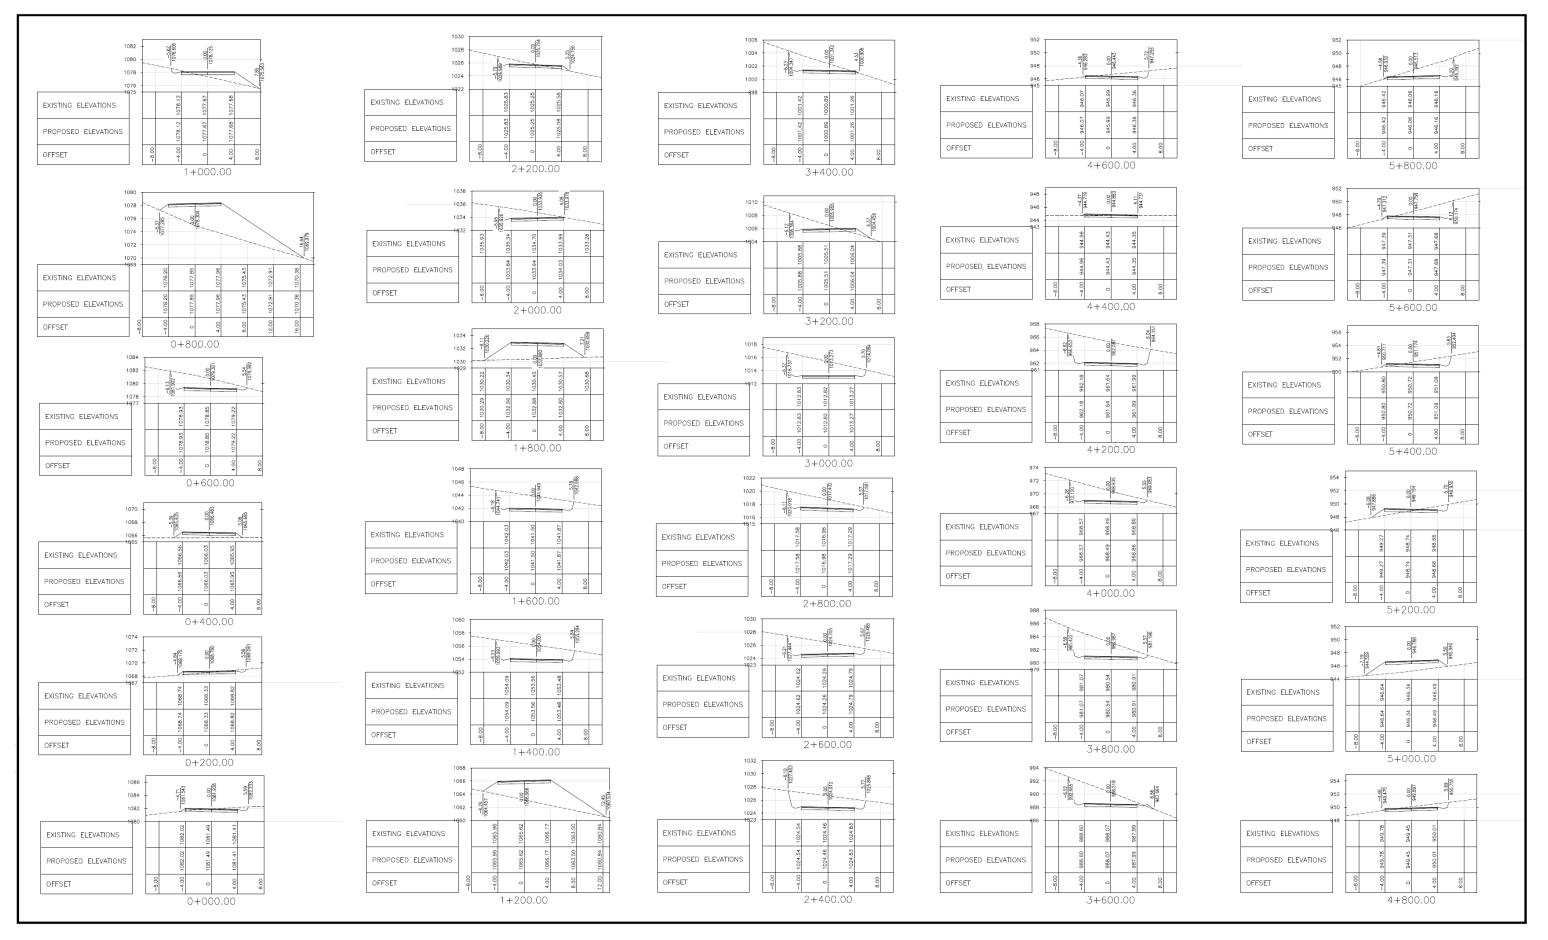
Smithfield Dam – Cross sections of access road to Nonguqa
